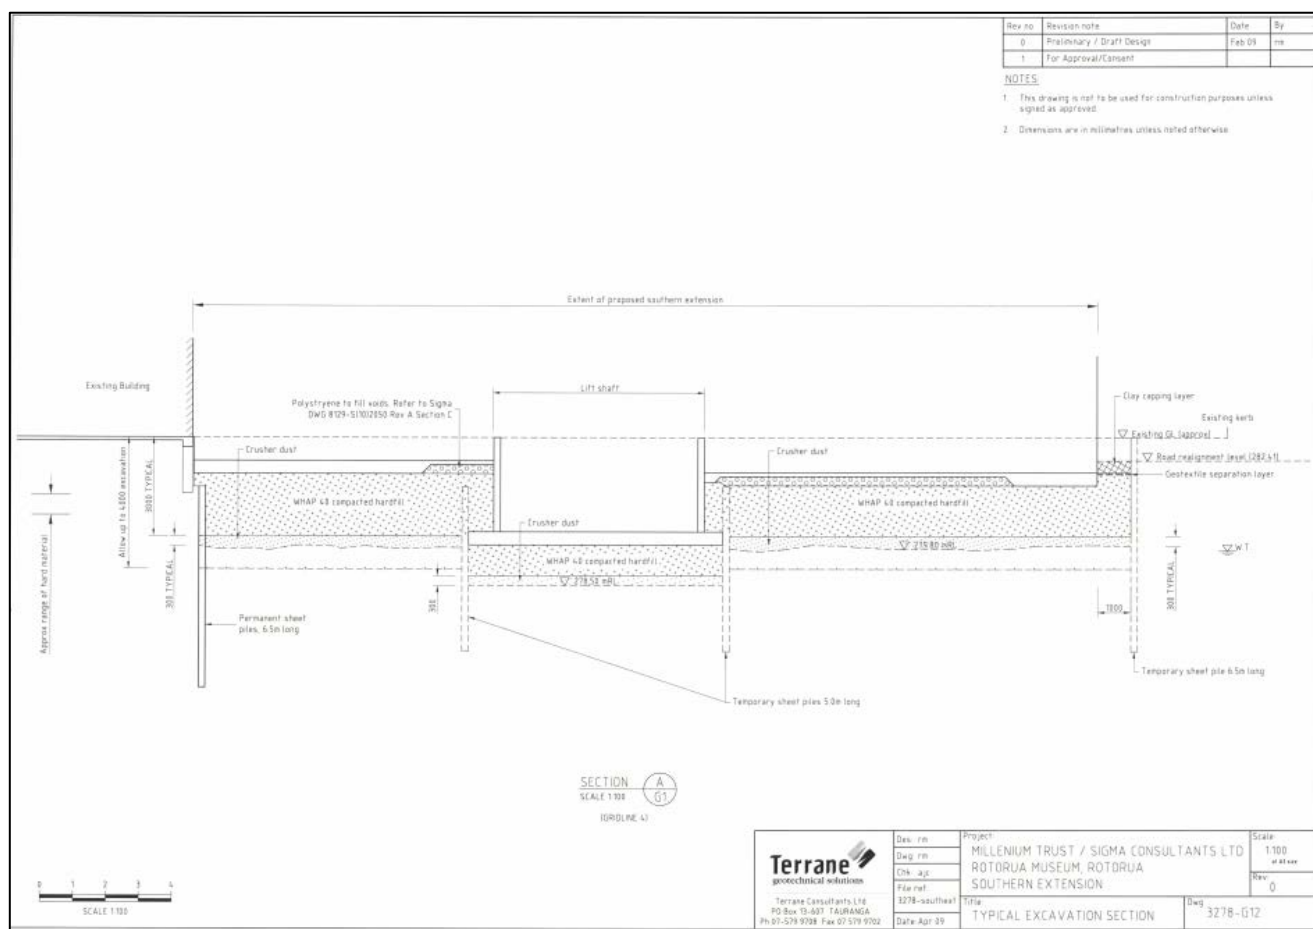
Typical excavation section, Dwg 3278-G12, Terrane, April 2009
